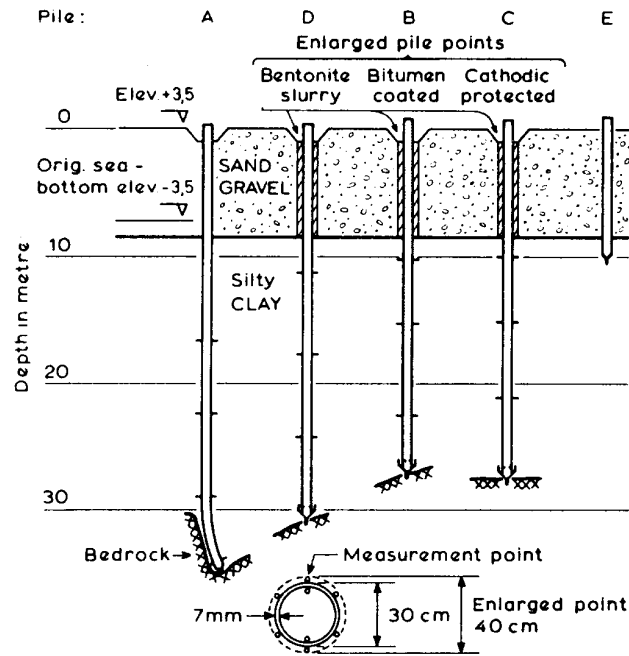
Vertical view of test site and piles (Bjerrum et al., 1969)
